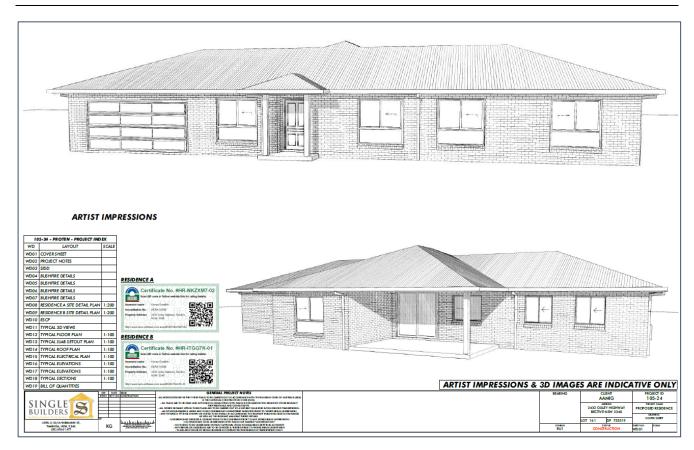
Proposed Manager's Dwellings (Single Builders, 2024)
